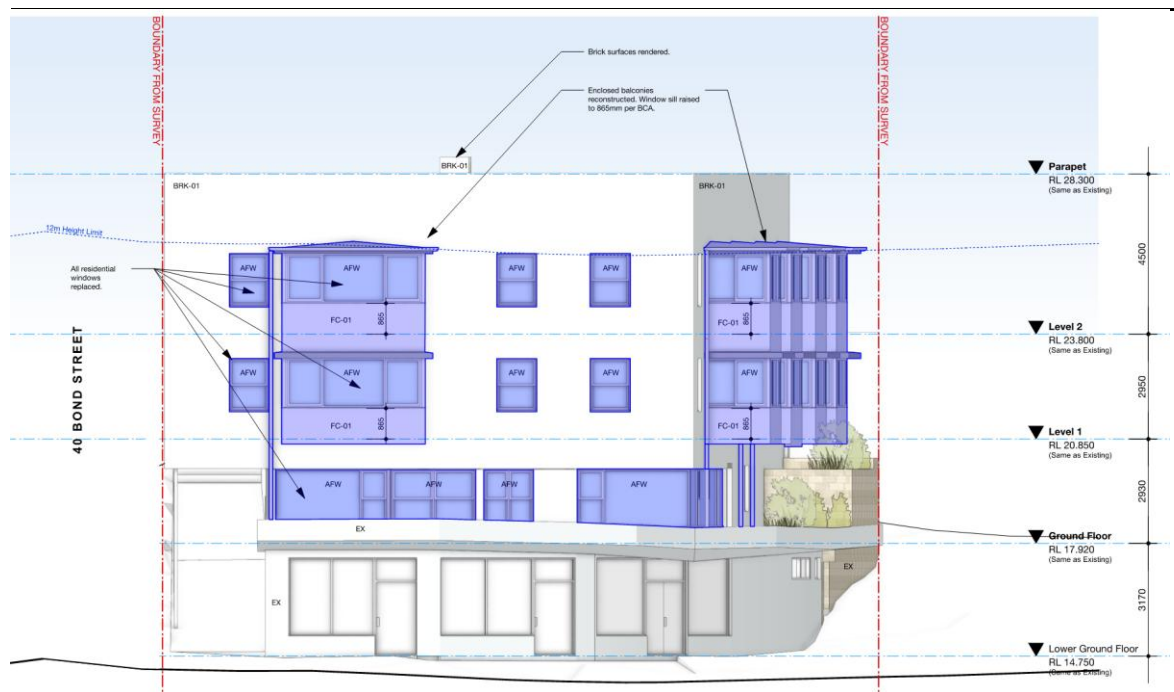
Proposed South Elevation (Source: Hill Thalys – 05/12/2025)
